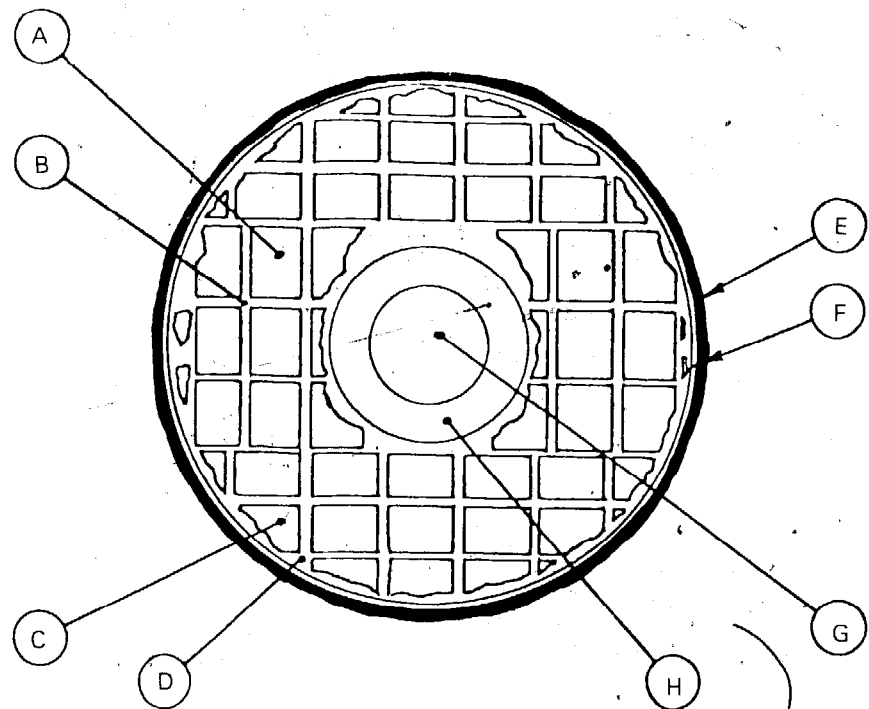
Plan view of brick-filled drum top with conical exhaust hole.
